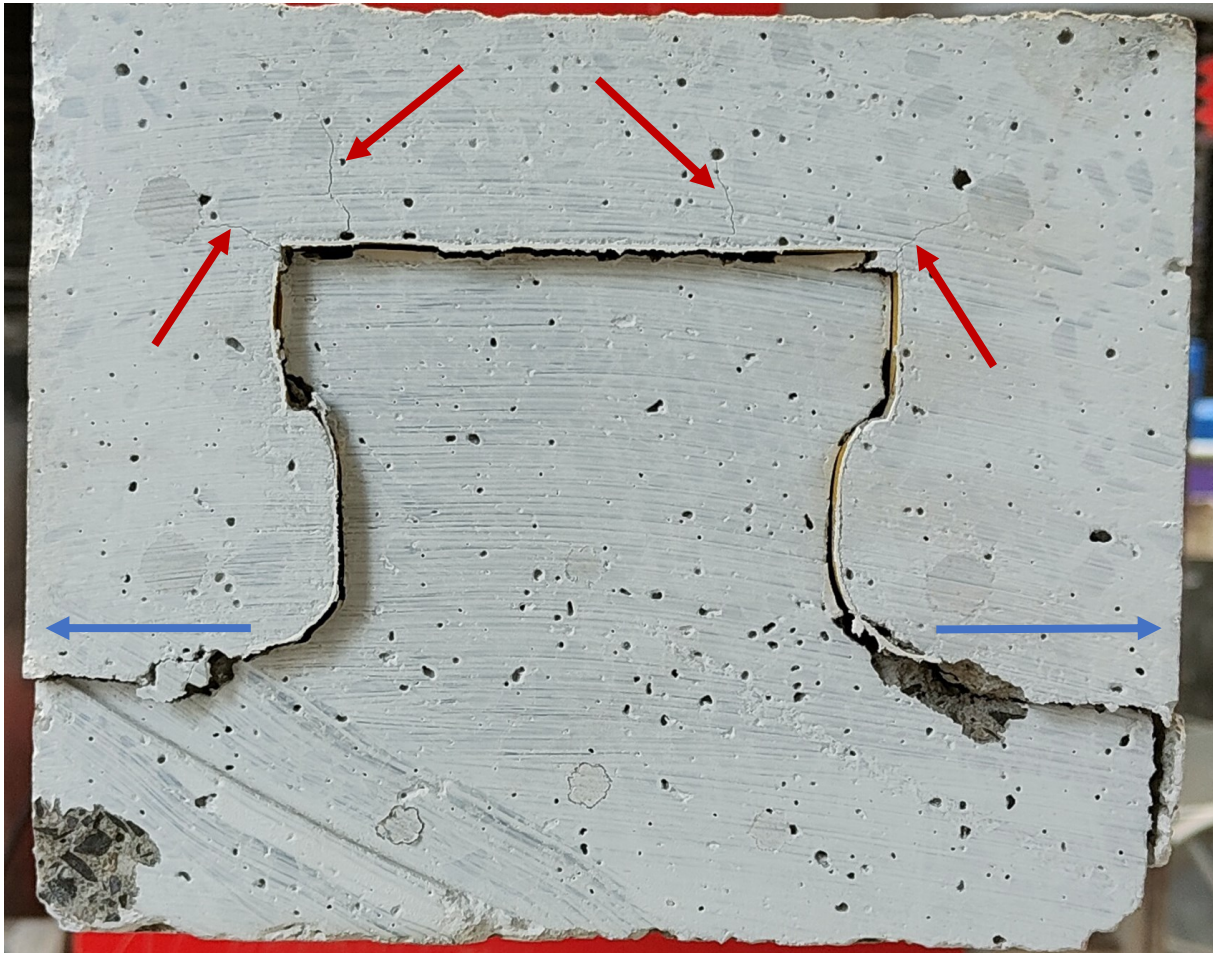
View of the face of beam Z8.3_B after failure – cracks in the corners of the topping
